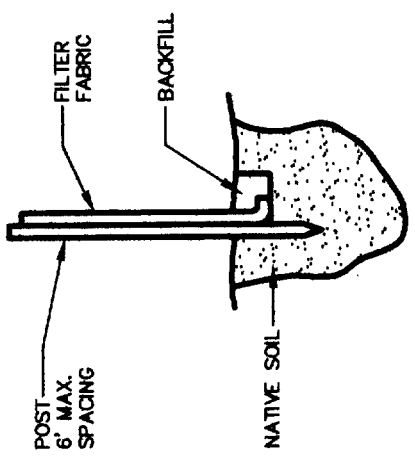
DETAIL SHEET FOR A SINGLE FAMILY DWELLING
